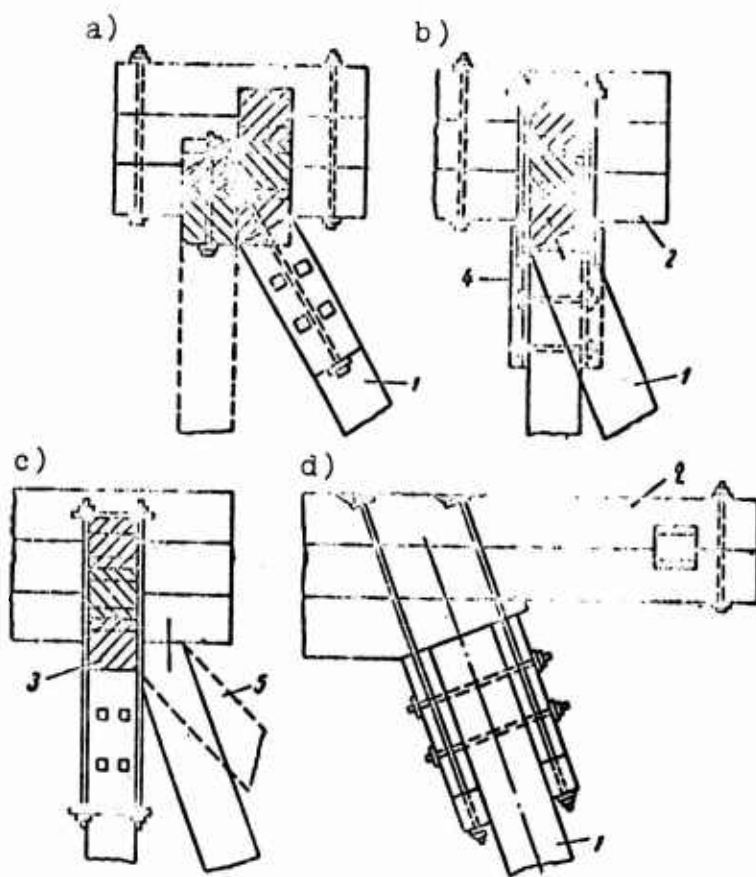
The basic joints of wooden pile drivers: a, b) abutment of the boom to the rear trusses of the pile drivers; c) abutment of the boom to the rear trusses and braces to the front trusses of pile drivers; d) abutment of a boom to the underpulley beam; 1 - a boom; 2, 3 - underpulley and transverse beams; 4 - tension equipment; 5 - bracing.
